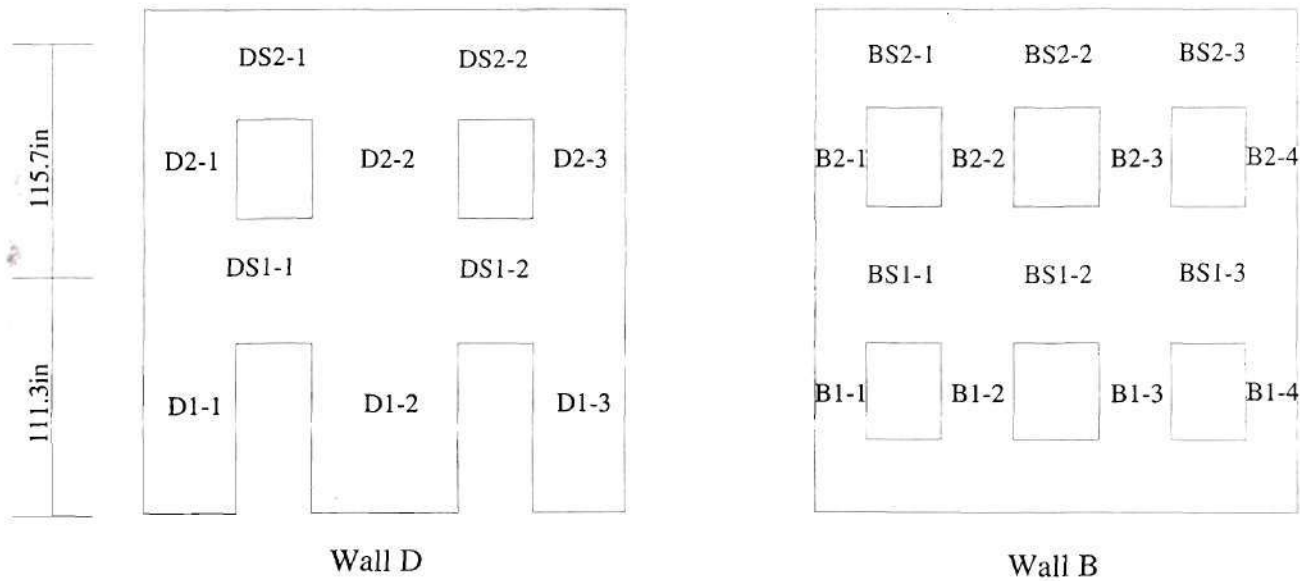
Elevation view of Wall D and Wall B (Magenes et al, 1995)
